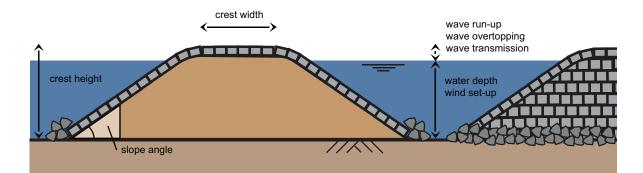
Cross-sectional View (left) and Side View (right) of Placed Block Breakwater
